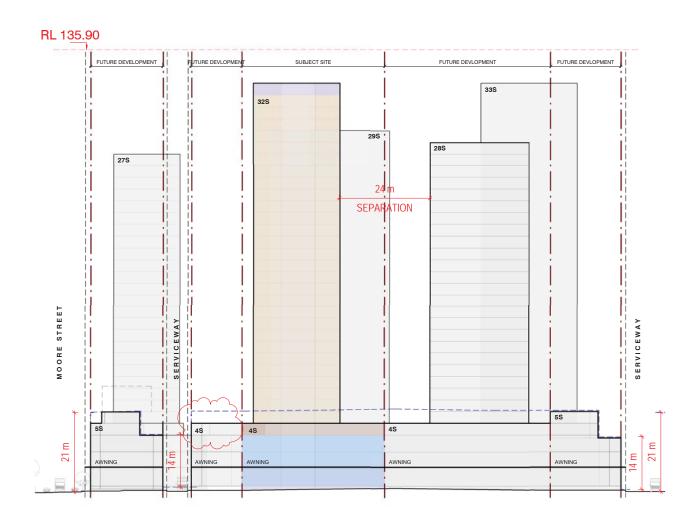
Tower on a Podium/Corner Site -Draft Liverpool Development Control Plan 2008
